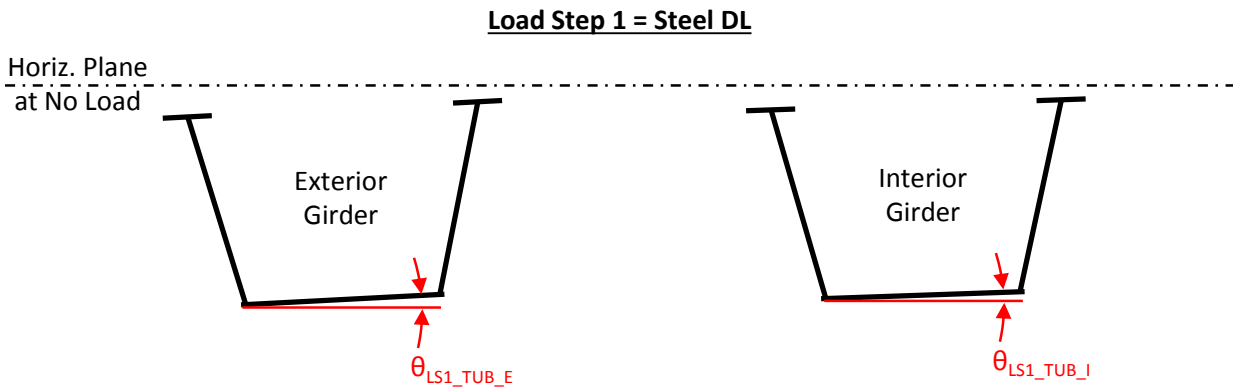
Load Step 1 – Unconnected Steel Tub Girder Twist – Section A-A
